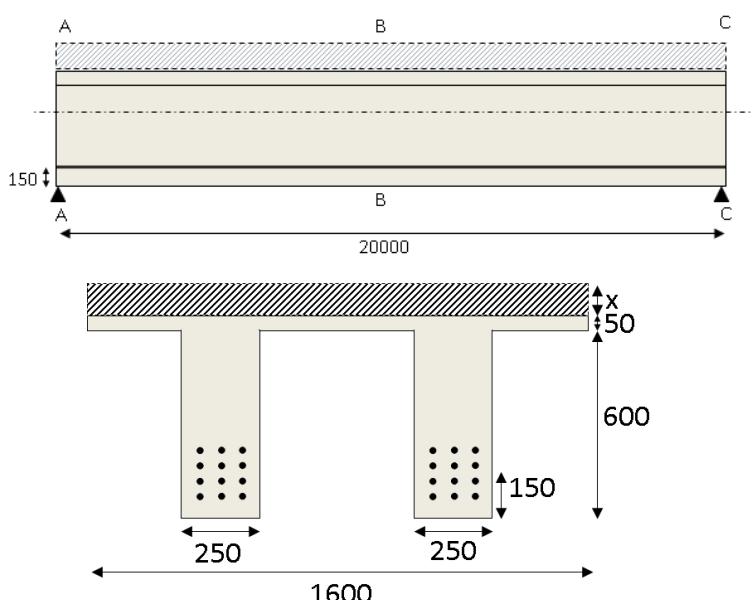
Overview of the girder including fictitious tendon profile and cross section B (tendons are indicative).
